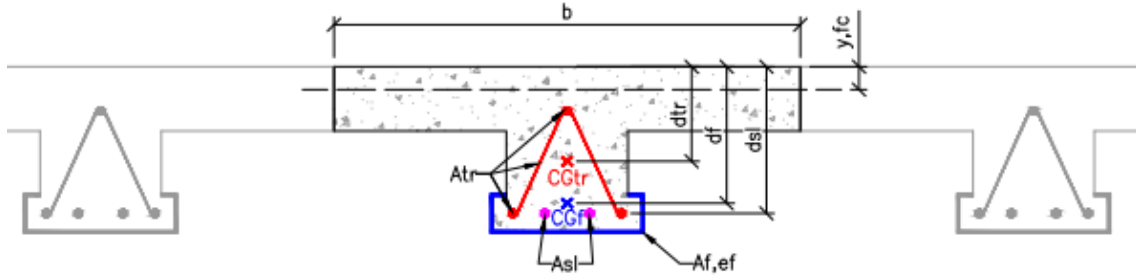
Geometric parameters to determine design properties of the composite cross-section.
